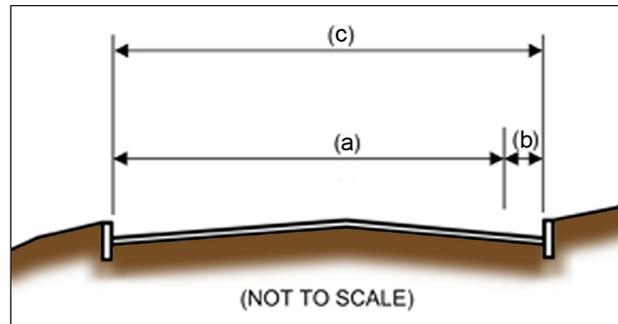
Cross-Section Profile -- Curbed Residential Access Street
